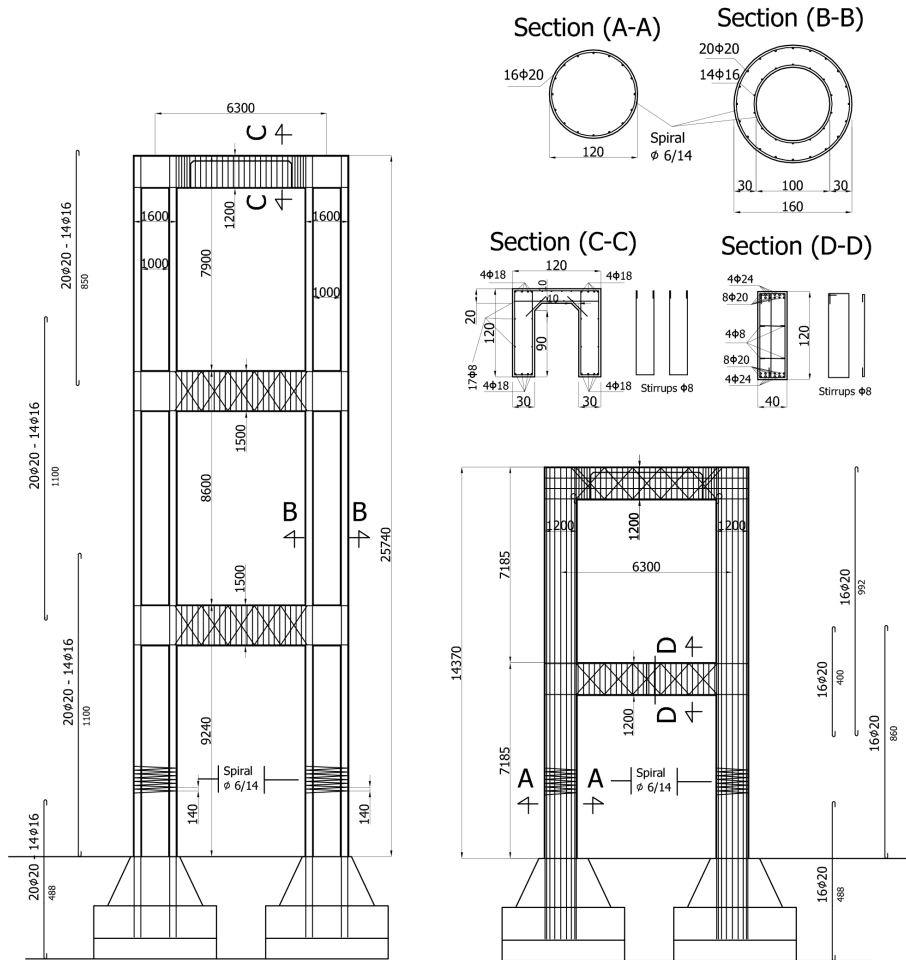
Details of Pier #9 and #11 reinforcements.
